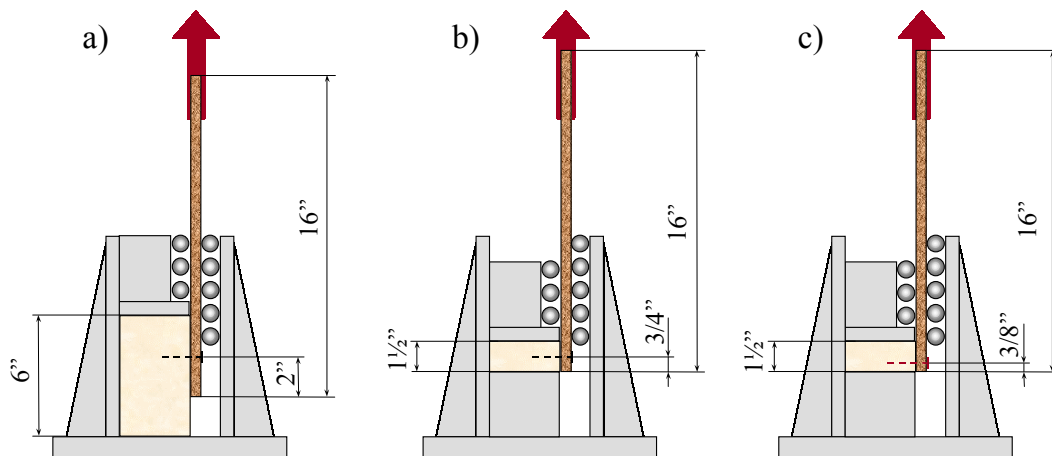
14. Test setup for sheathing-to-framing connections:
